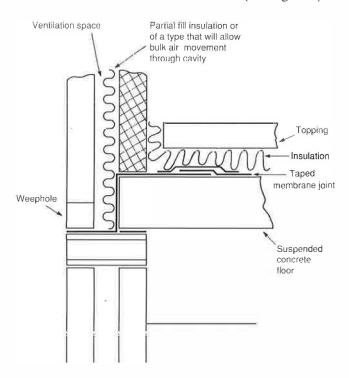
Avoidance of a slip plane within the wall by positioning the membrane joint over the floor
